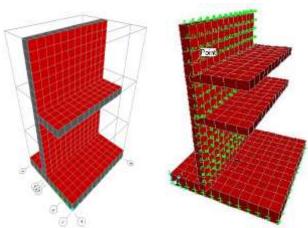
Schematic 3D Model of Cantilever retaining wall with one shelf
